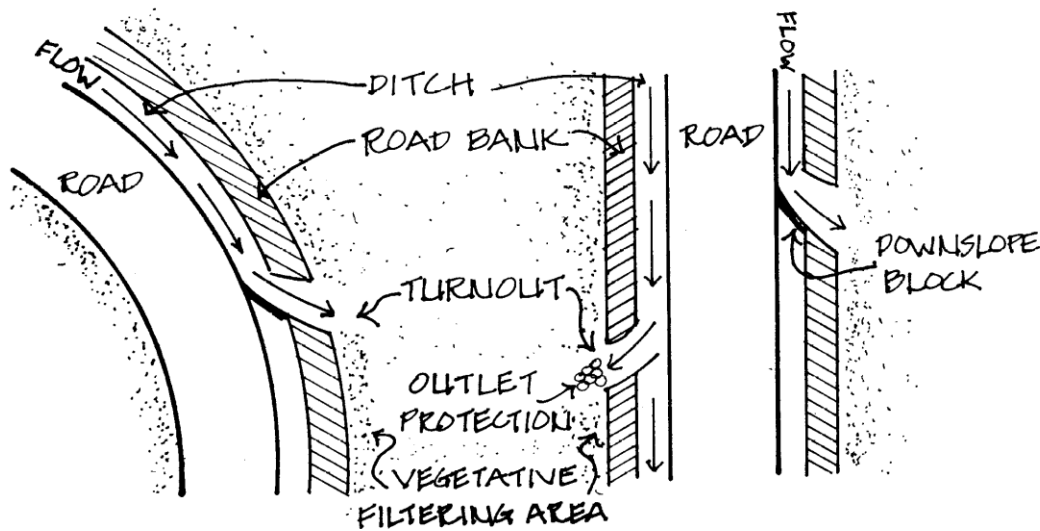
Shows ditch and turnout design alongside an access road (Commision, 2001)
